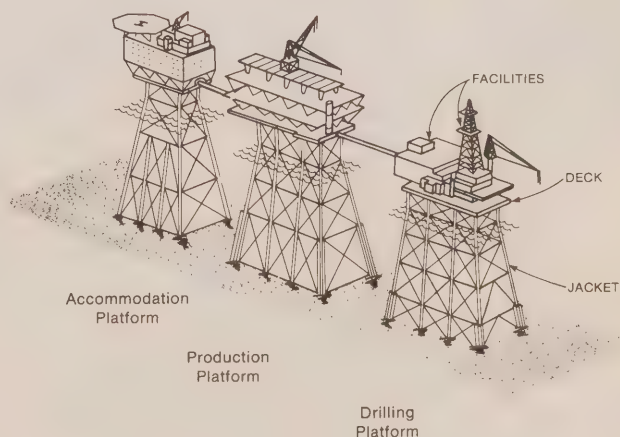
Typical Lattice Type Structural Details of A Platform Jacket
